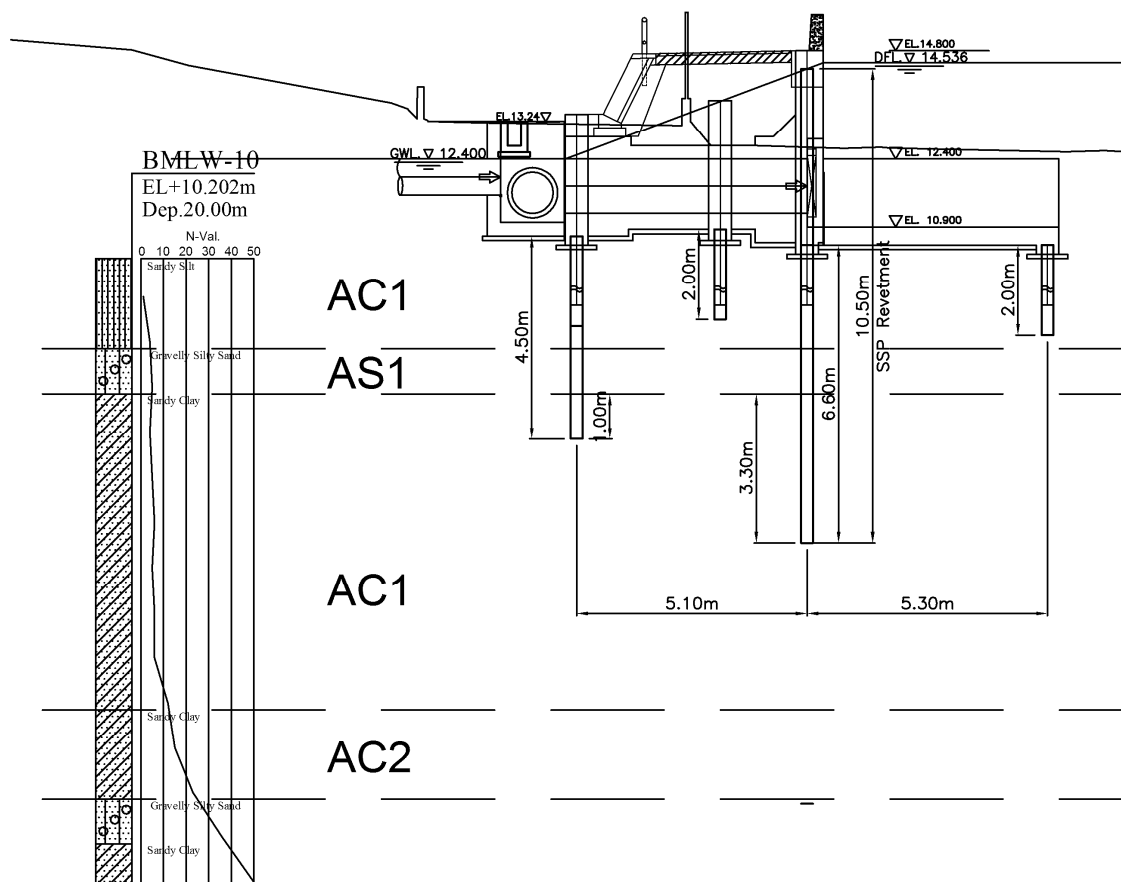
Length of SSP Cut off Wall (6/9) (MSL-6)
